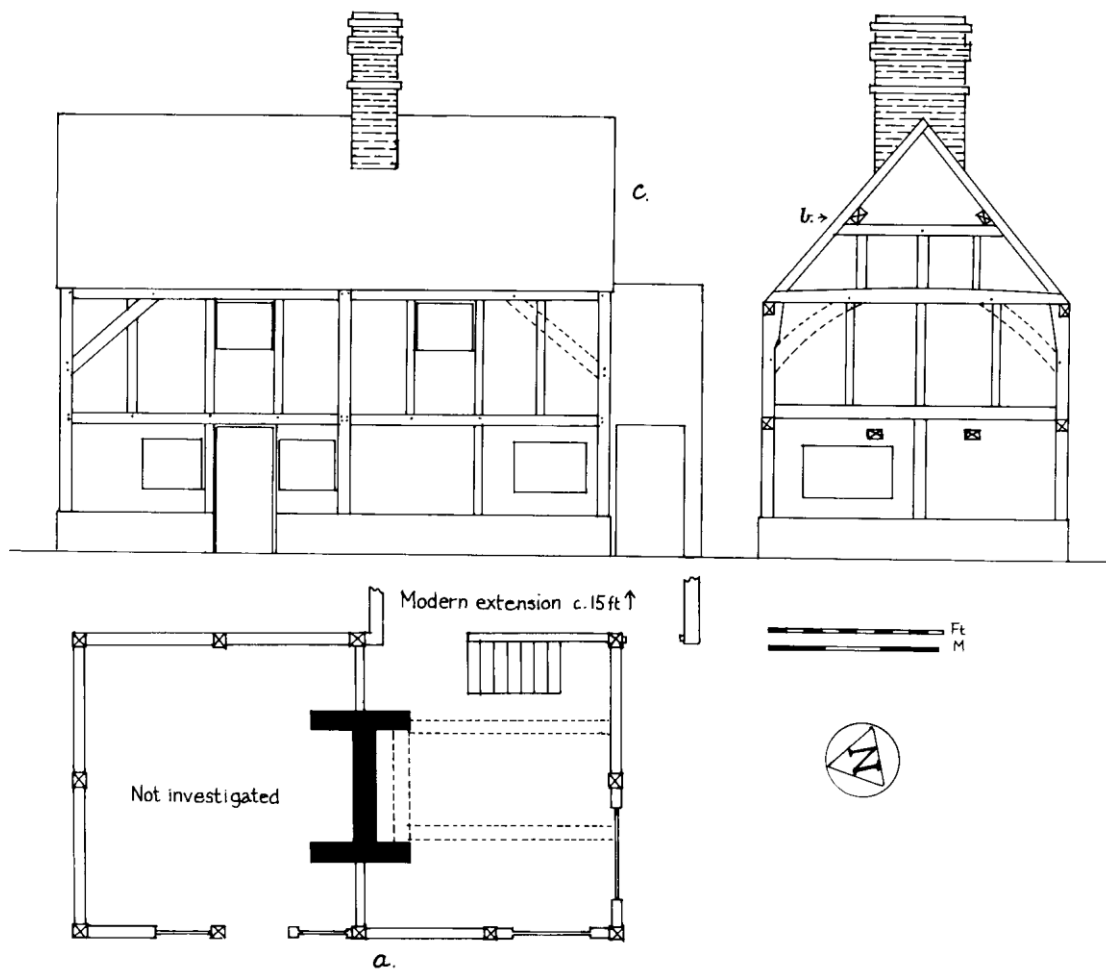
The Gardens, (a) Ground Plan, (b) Section at B-B. (c) West elevation.
